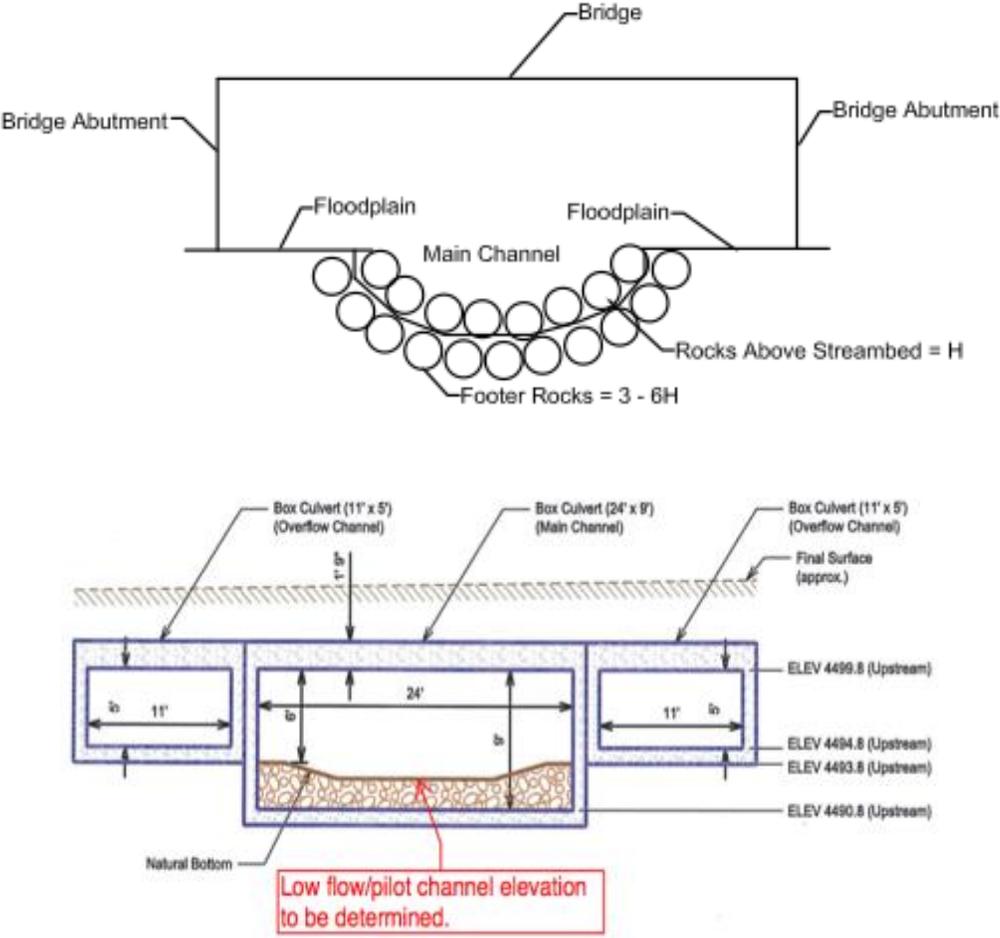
Plan View for Implementing a Restoration Structure Near a Bridge.
